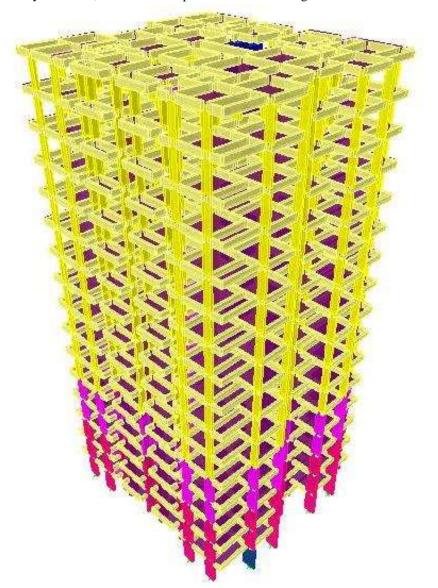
3D Model of G+15 Storied Conventional Beam Column System Building
